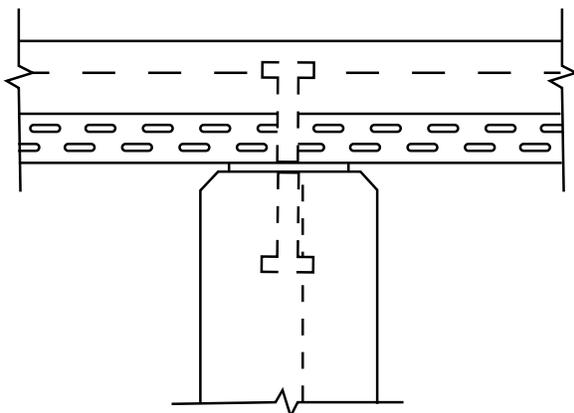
CONCRETE OR CMU WALL WITH EMBED PERPENDICULAR
